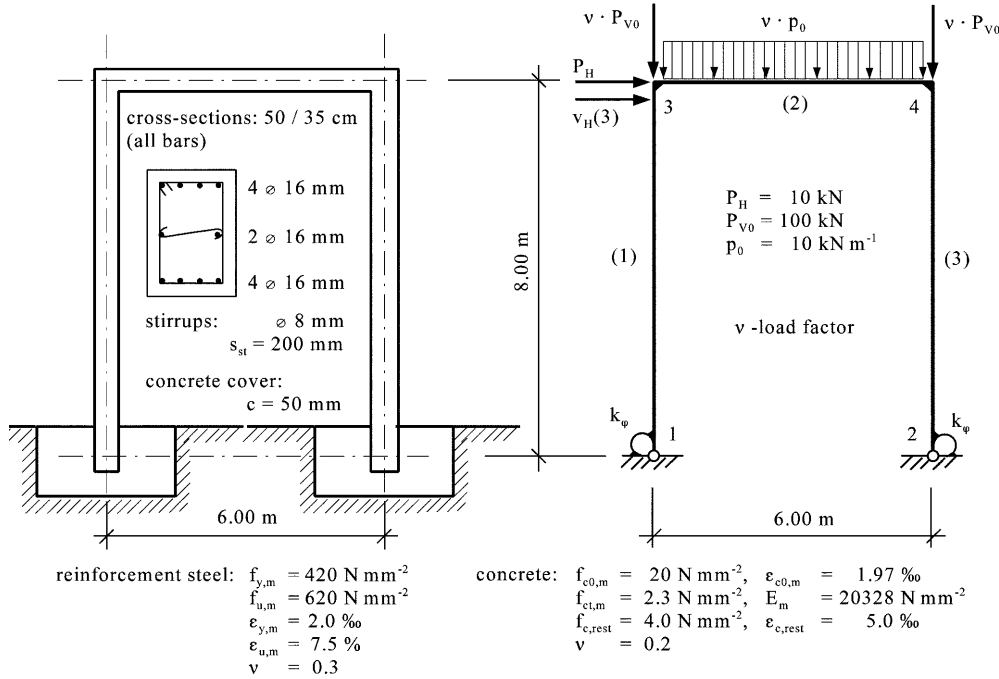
Reinforced concrete frame (plane); structure, cross-sections, materials, statical system with loading
